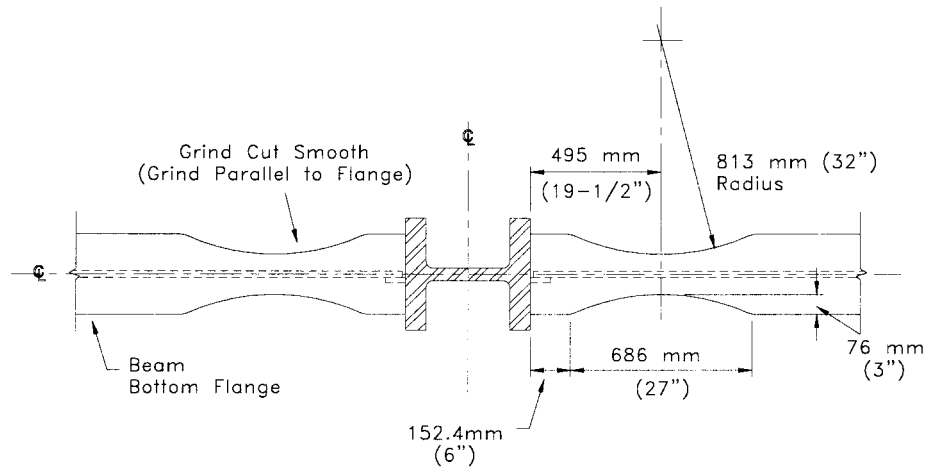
Plan Views of RBS Connection (RBS at Bottom Flange Only)
